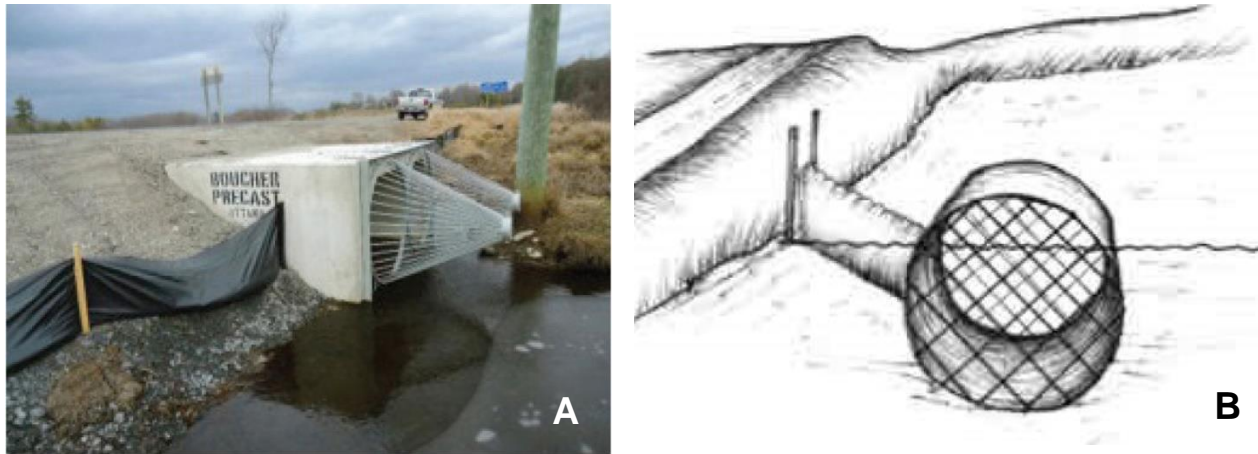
Beavercone (photo: beavercone.com) installed on a culvert (A), and T-culvert (drawing: J. Jones) installed over a culvert (B) (Image A in Hawley-Yan 2016 and image B in USDA Forest Service 2005)
